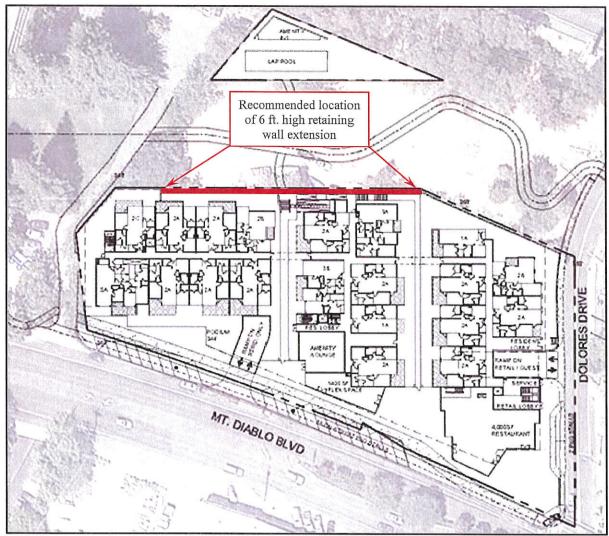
Level 1 Conceptual Plan Showing Locations of 6 foot high Noise Barriers
